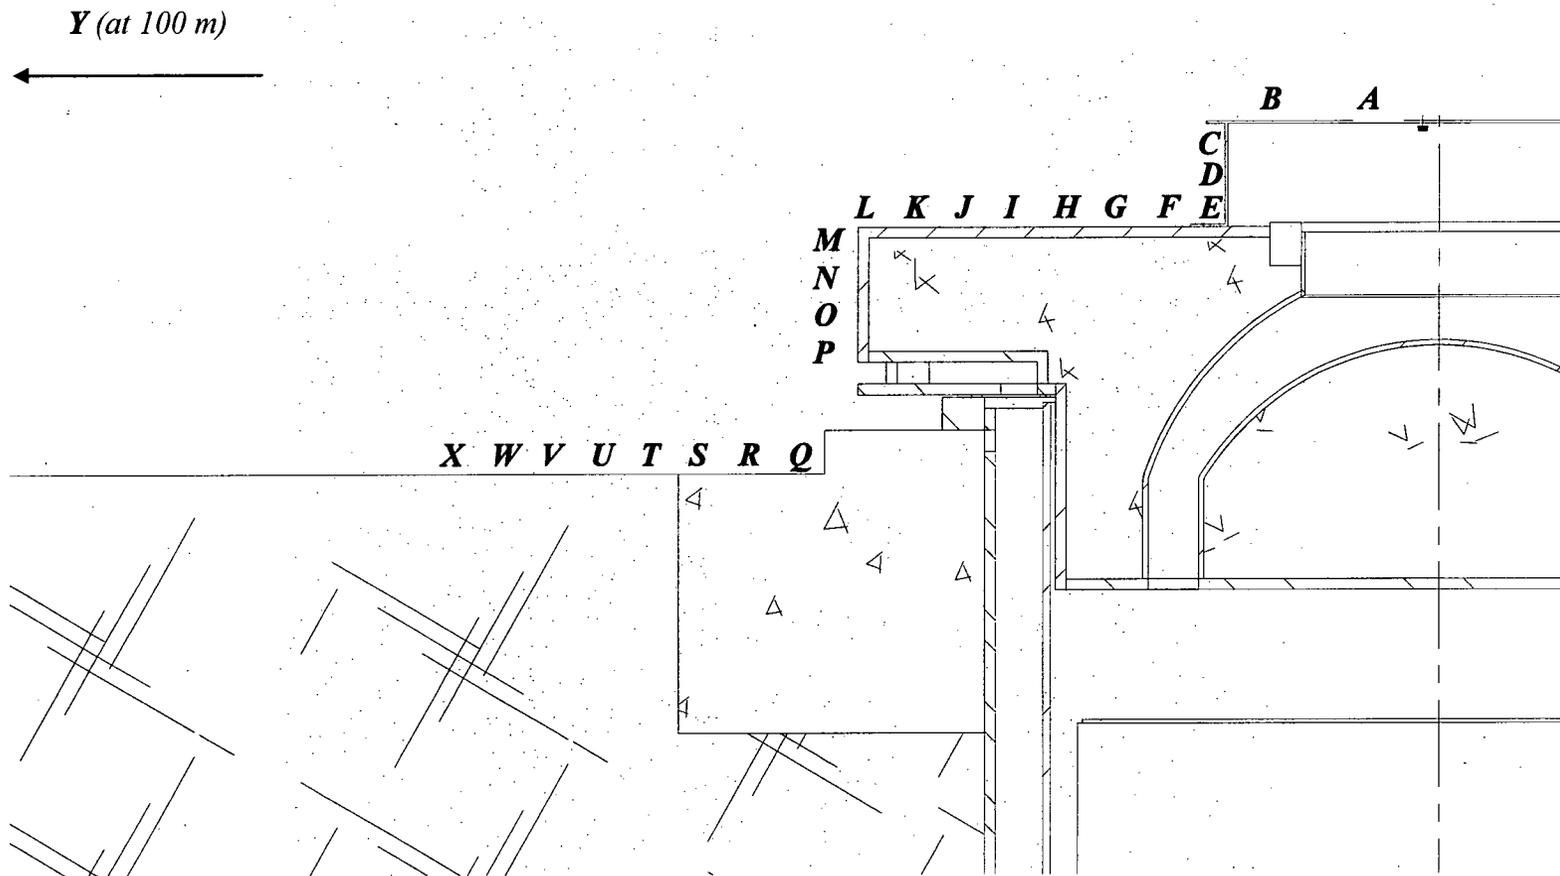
I.3; HI-STORM 100U MODULE CROSS SECTIONAL ELEVATION VIEW WITH DOSE POINT LOCATIONS
